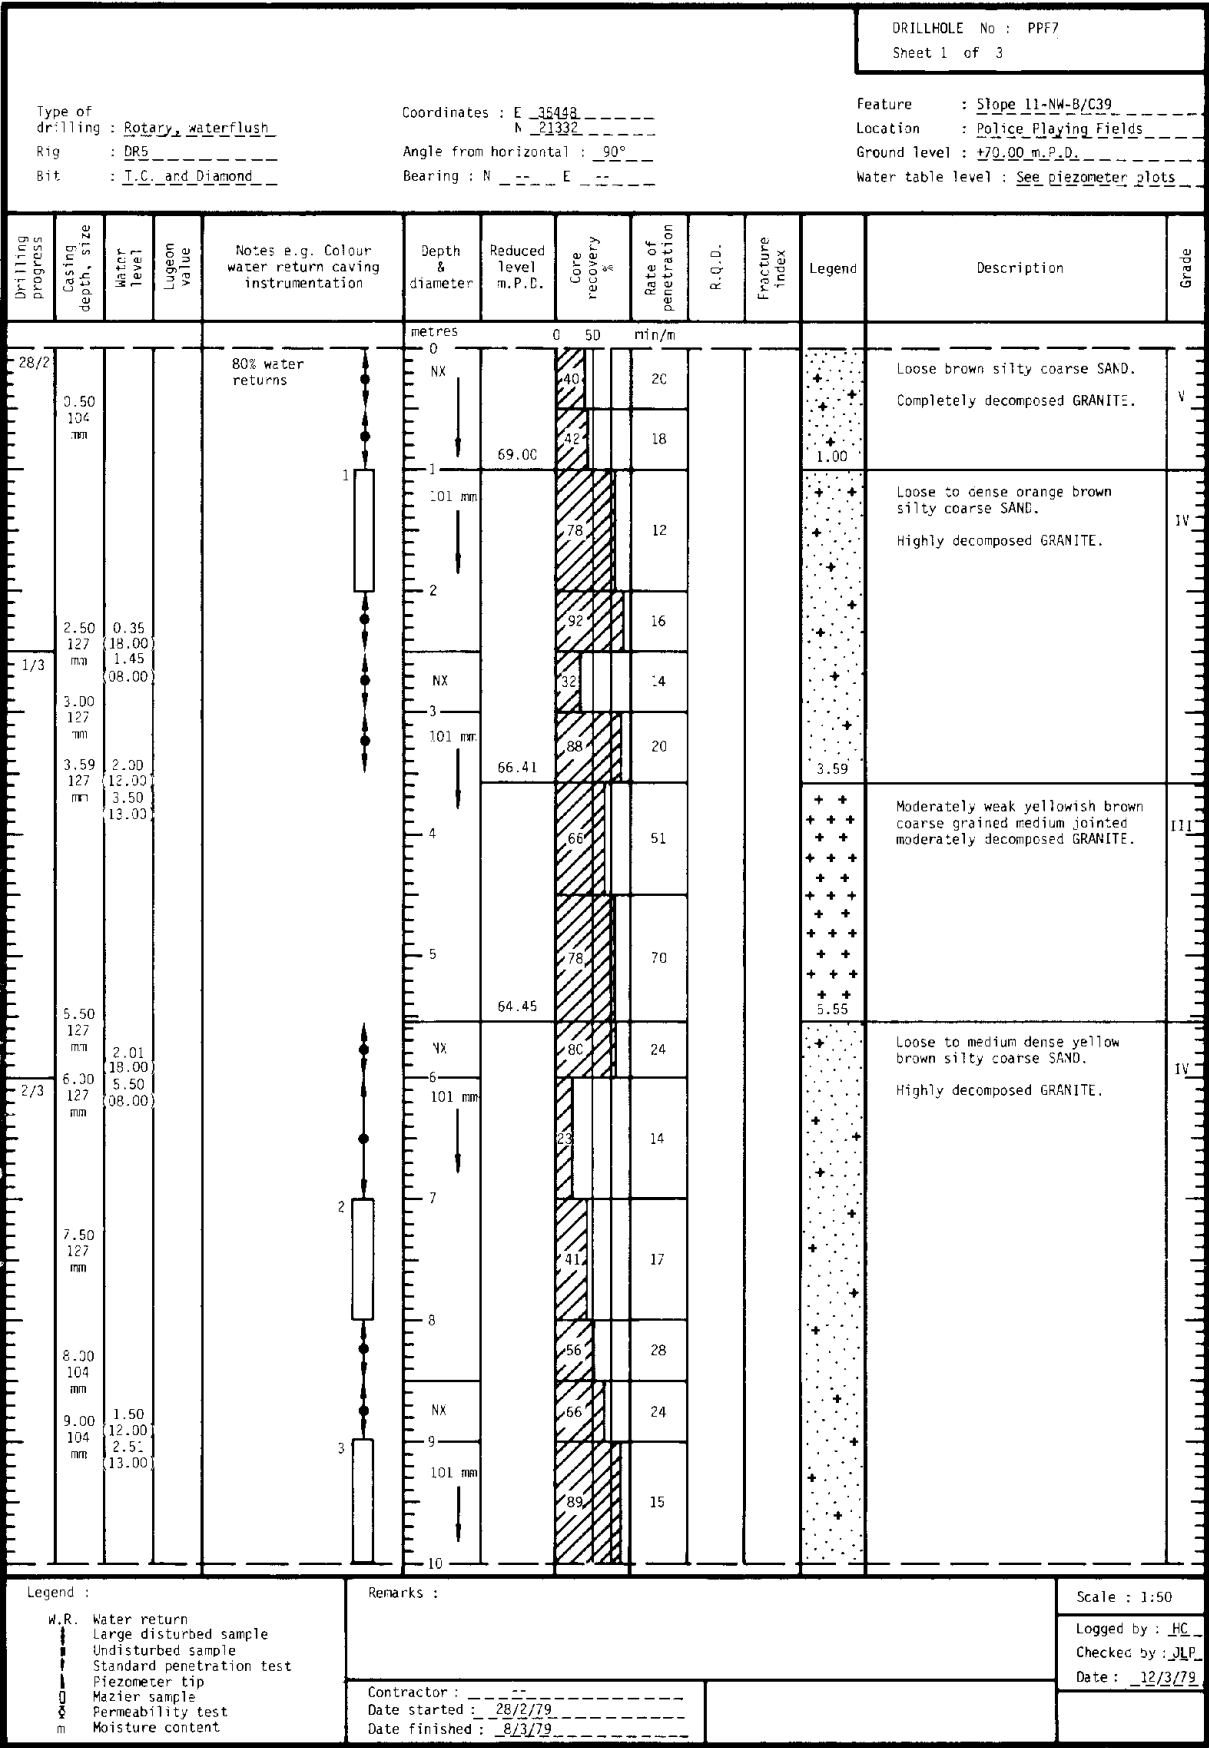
Sheet One of Log of Drillcore Shown in Plates 2.15 to 2.26
